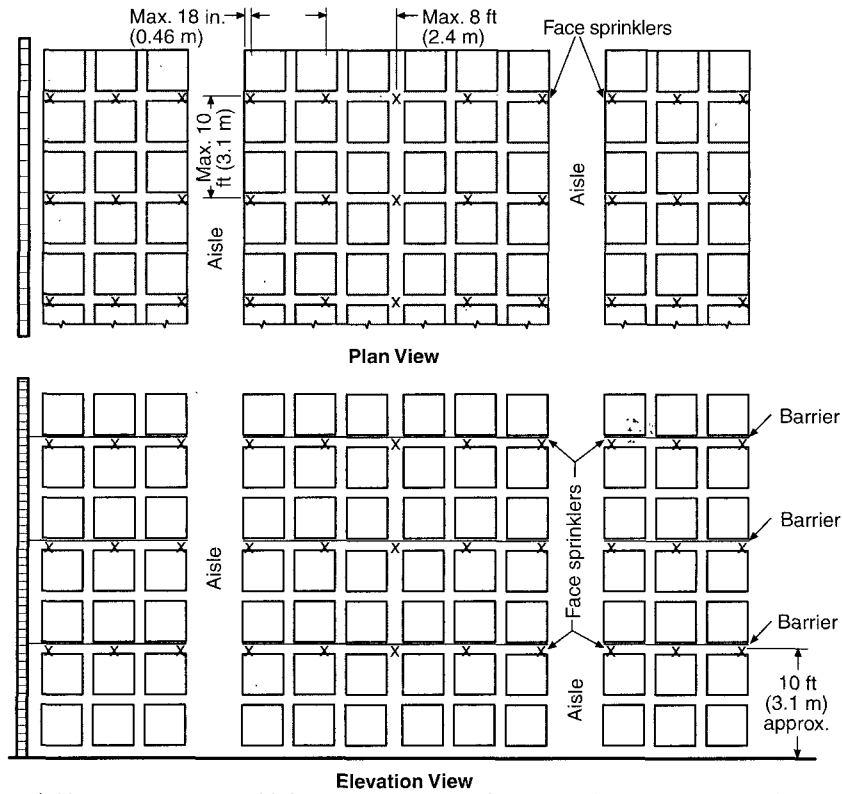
(b)* In-rack sprinkler arrangement, multiple-row racks, cartoned plastic and exposed unexpanded plastic, storage height over 25 ft (7.6 m).
